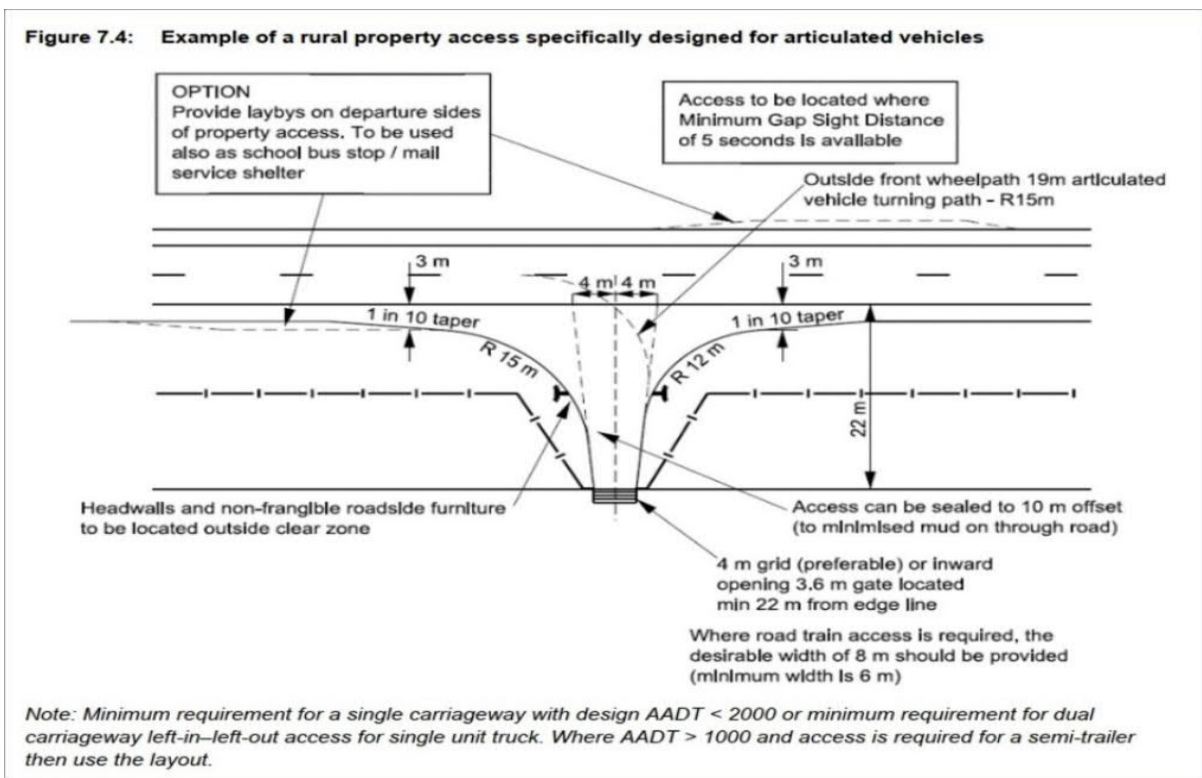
Proposed Site Access Configuration – SA1, SA2 & SA3 Avenue Road
